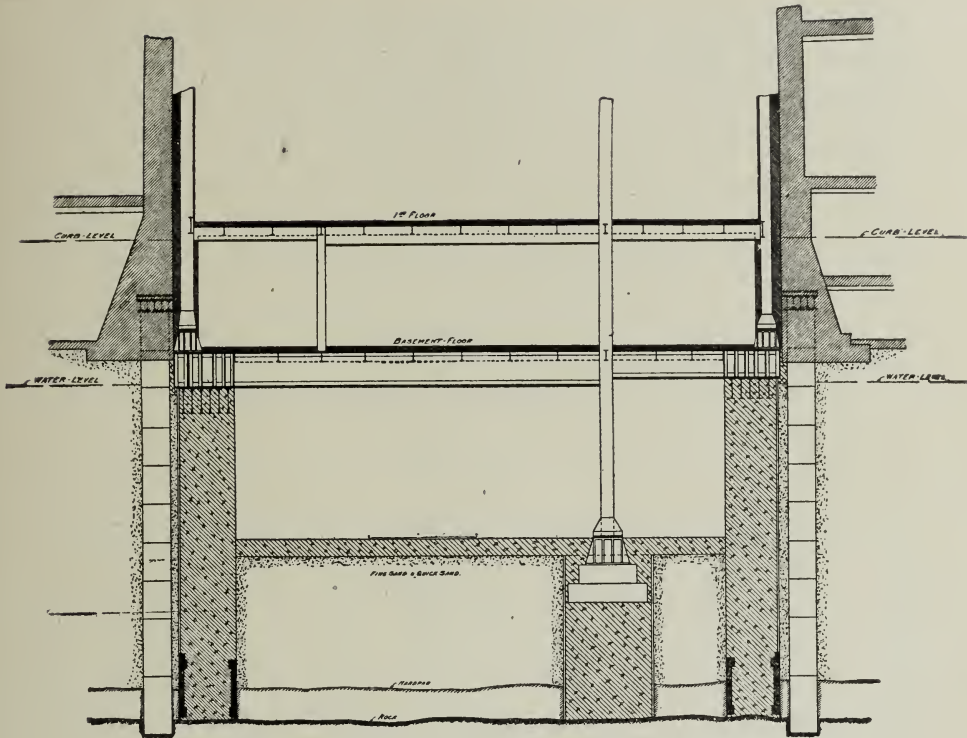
Section of Caisson and Pier Foundation, Singer Building, New York.
